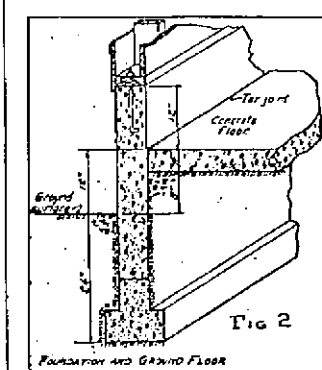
Showing a Good Method of Making Foundation and Floor of a New Building Ratproof.
